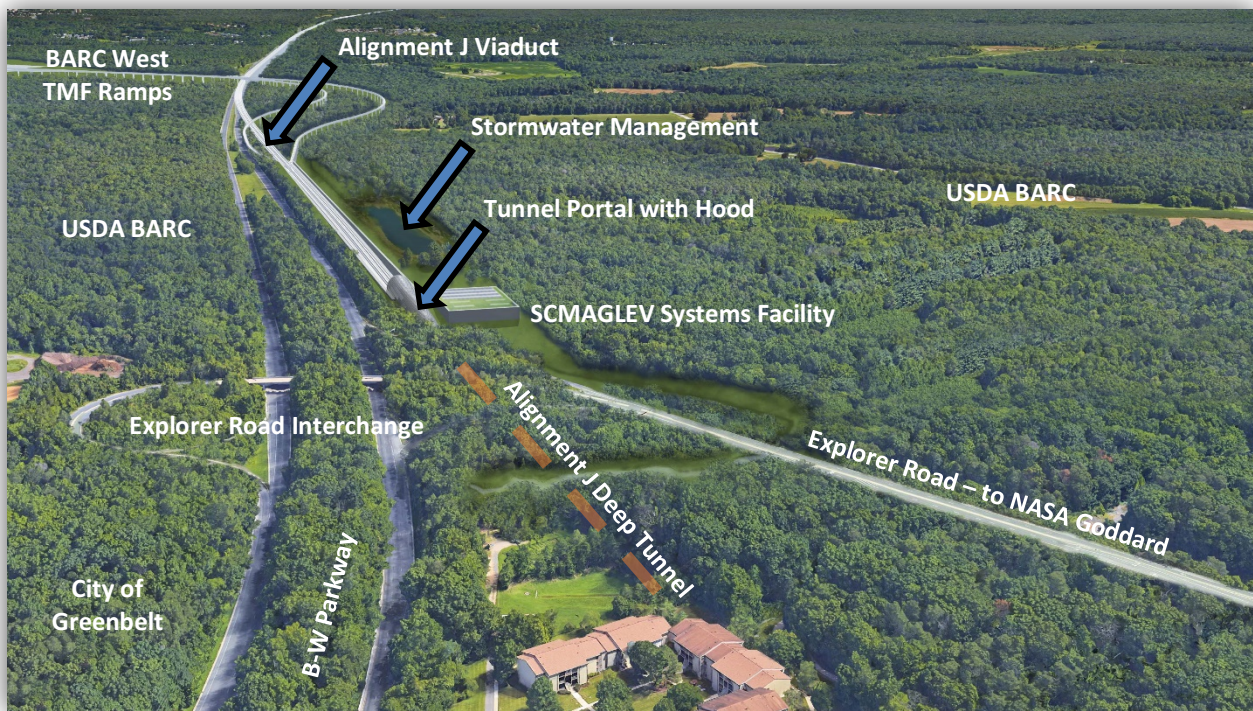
CAAs #5, #6, #7, #8, #9 AFTER: Illustrative Rendering of Alignment J Tunnel Portal at Explorer Road Interchange with Ramps to BARC West TMF, Looking North
